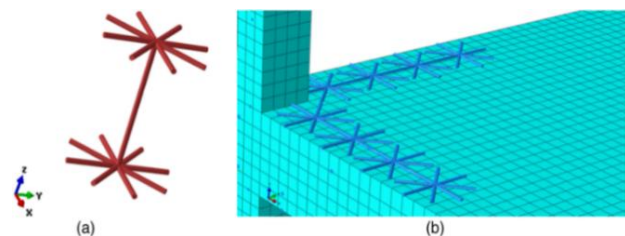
Assembled truss/beam for shear bolt modelling [26]
